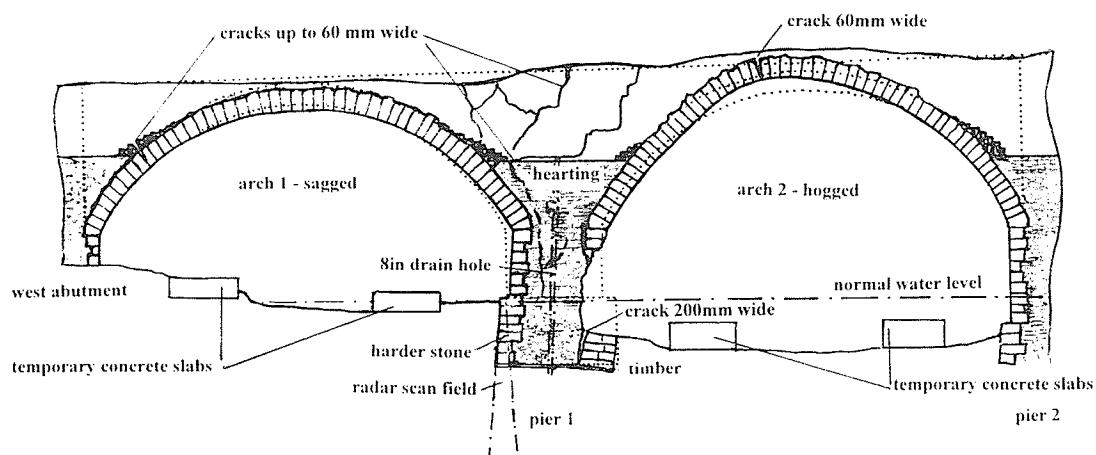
Sketch section of pier 1 and adjoining arches with spandrel fill removed - looking north.
